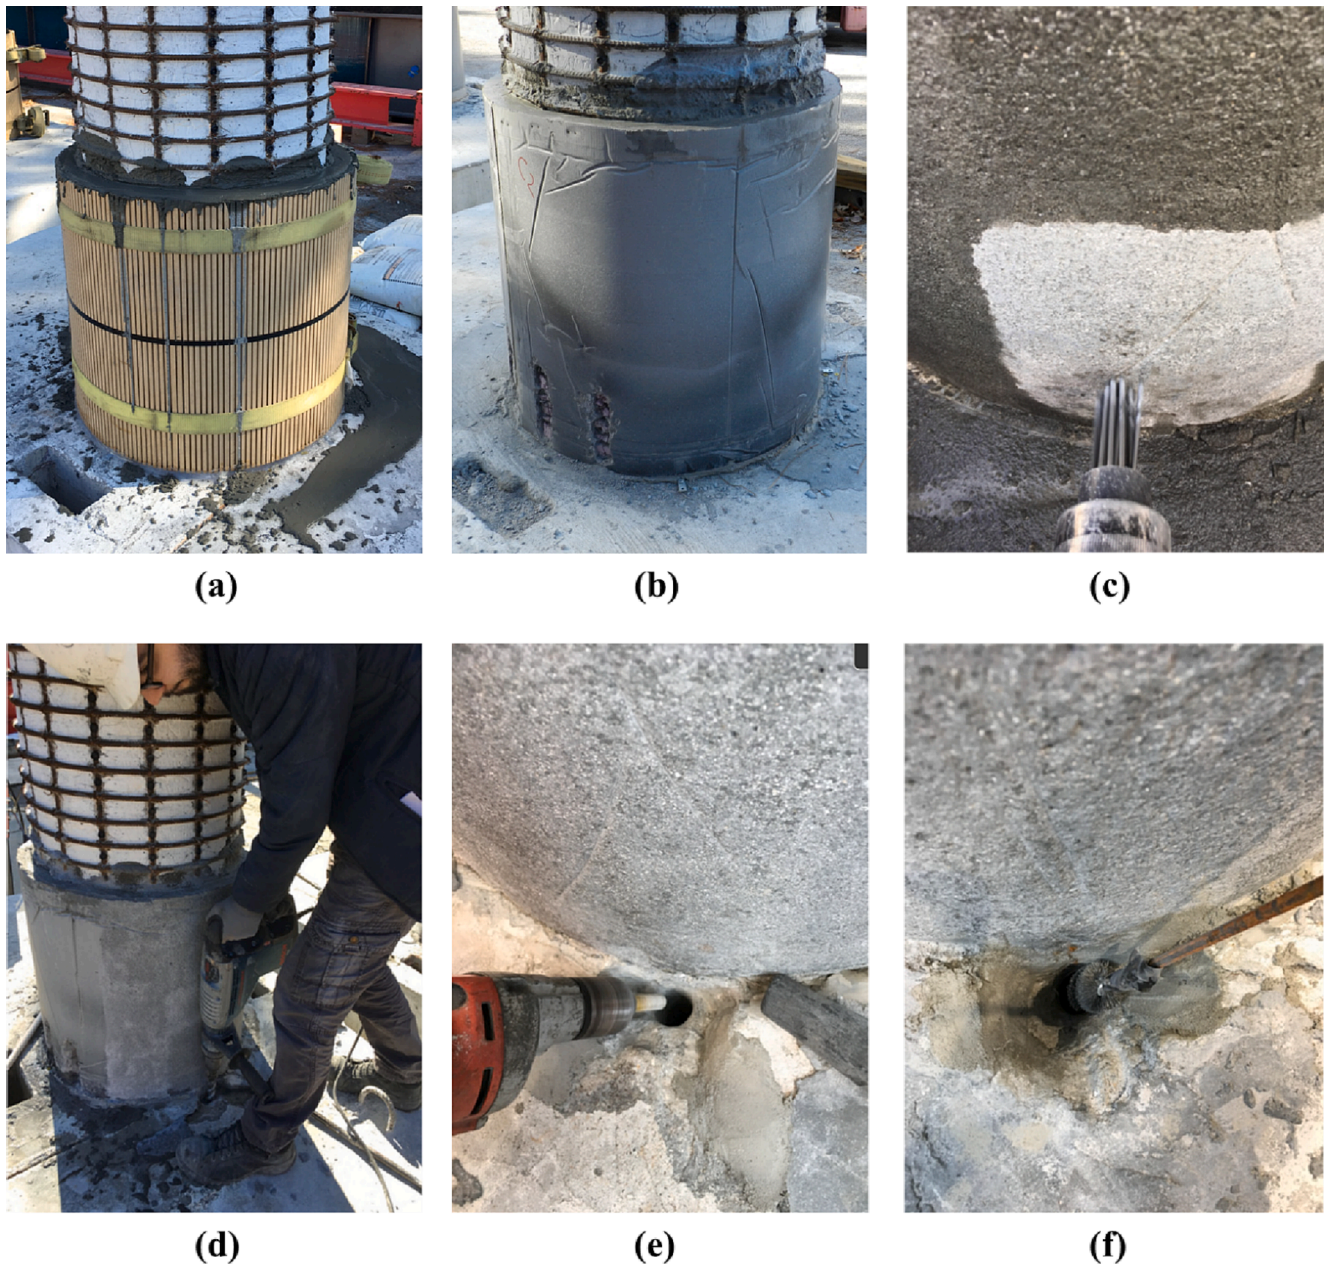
Preparation of Cover Concrete: a) Flexible Form with High-Strength Non-Shrink Grout, b) Restored Cross Section, c) Surface Roughening, d) Anchor Hole Drilling, e) Anchor Hole Edge Rounding, f) Brushing.
